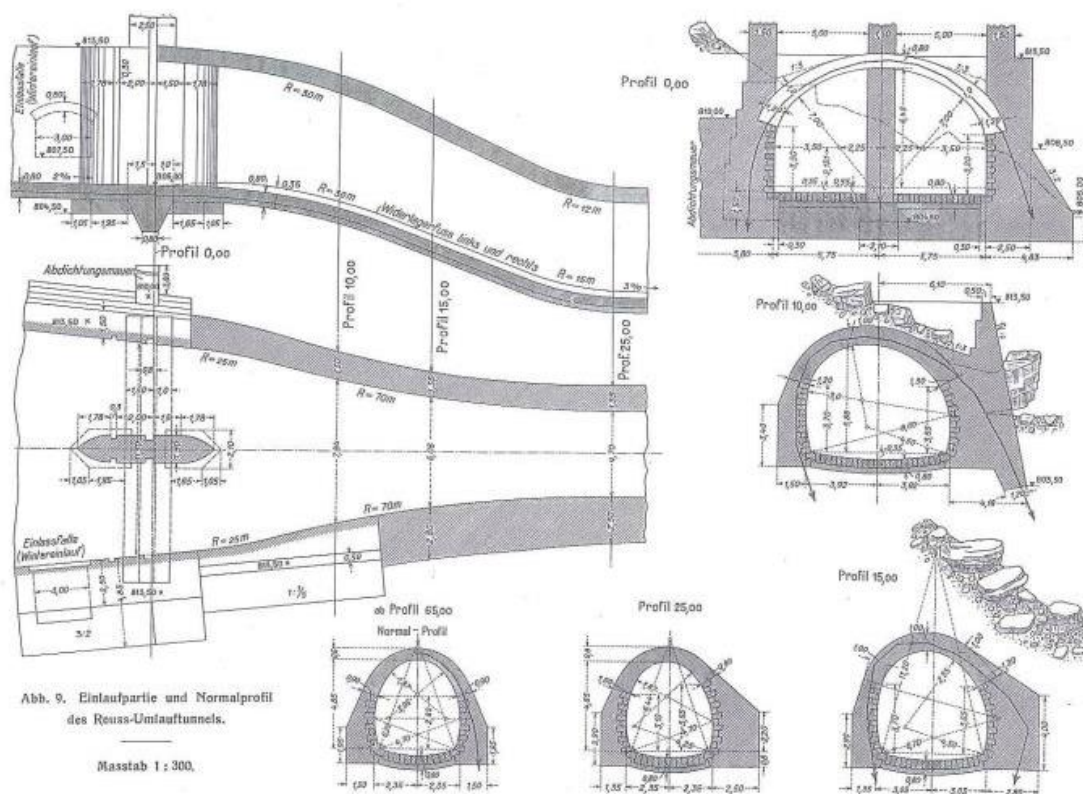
Inlet area and cross sections of the Pfaffensprung sediment bypass tunnel. Bottom left: normal profile
